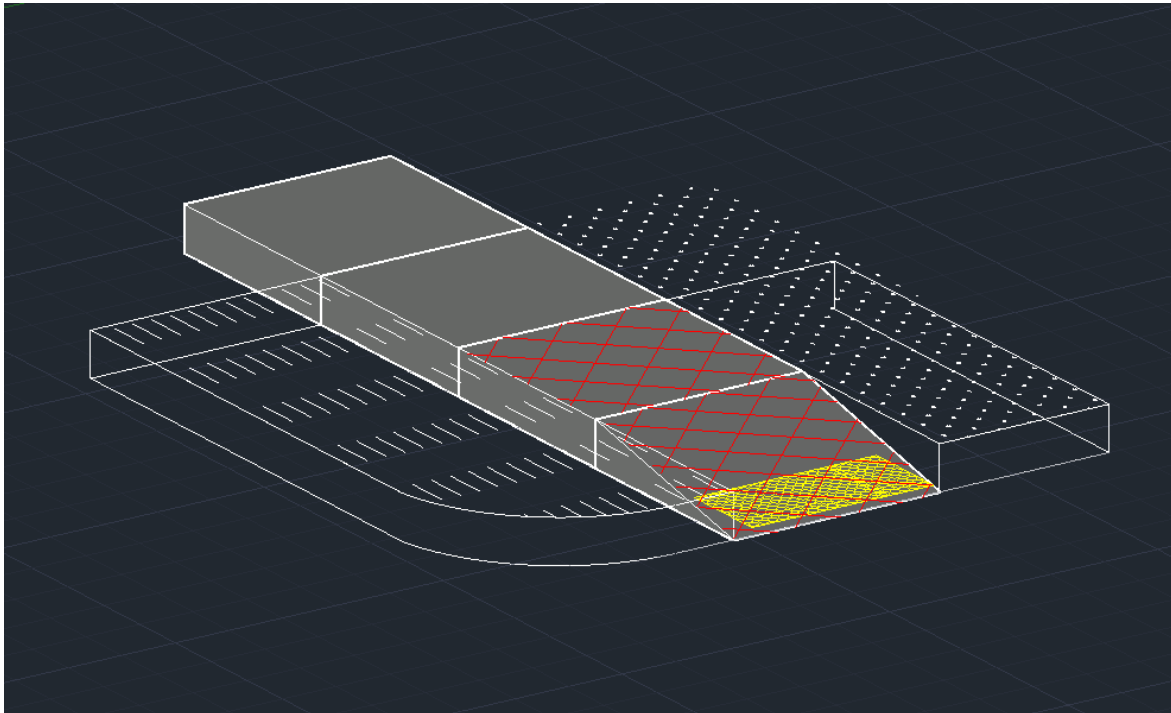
Proposed AutoCAD Model of Curb Ramp i at Intersection K in Zone 4.
